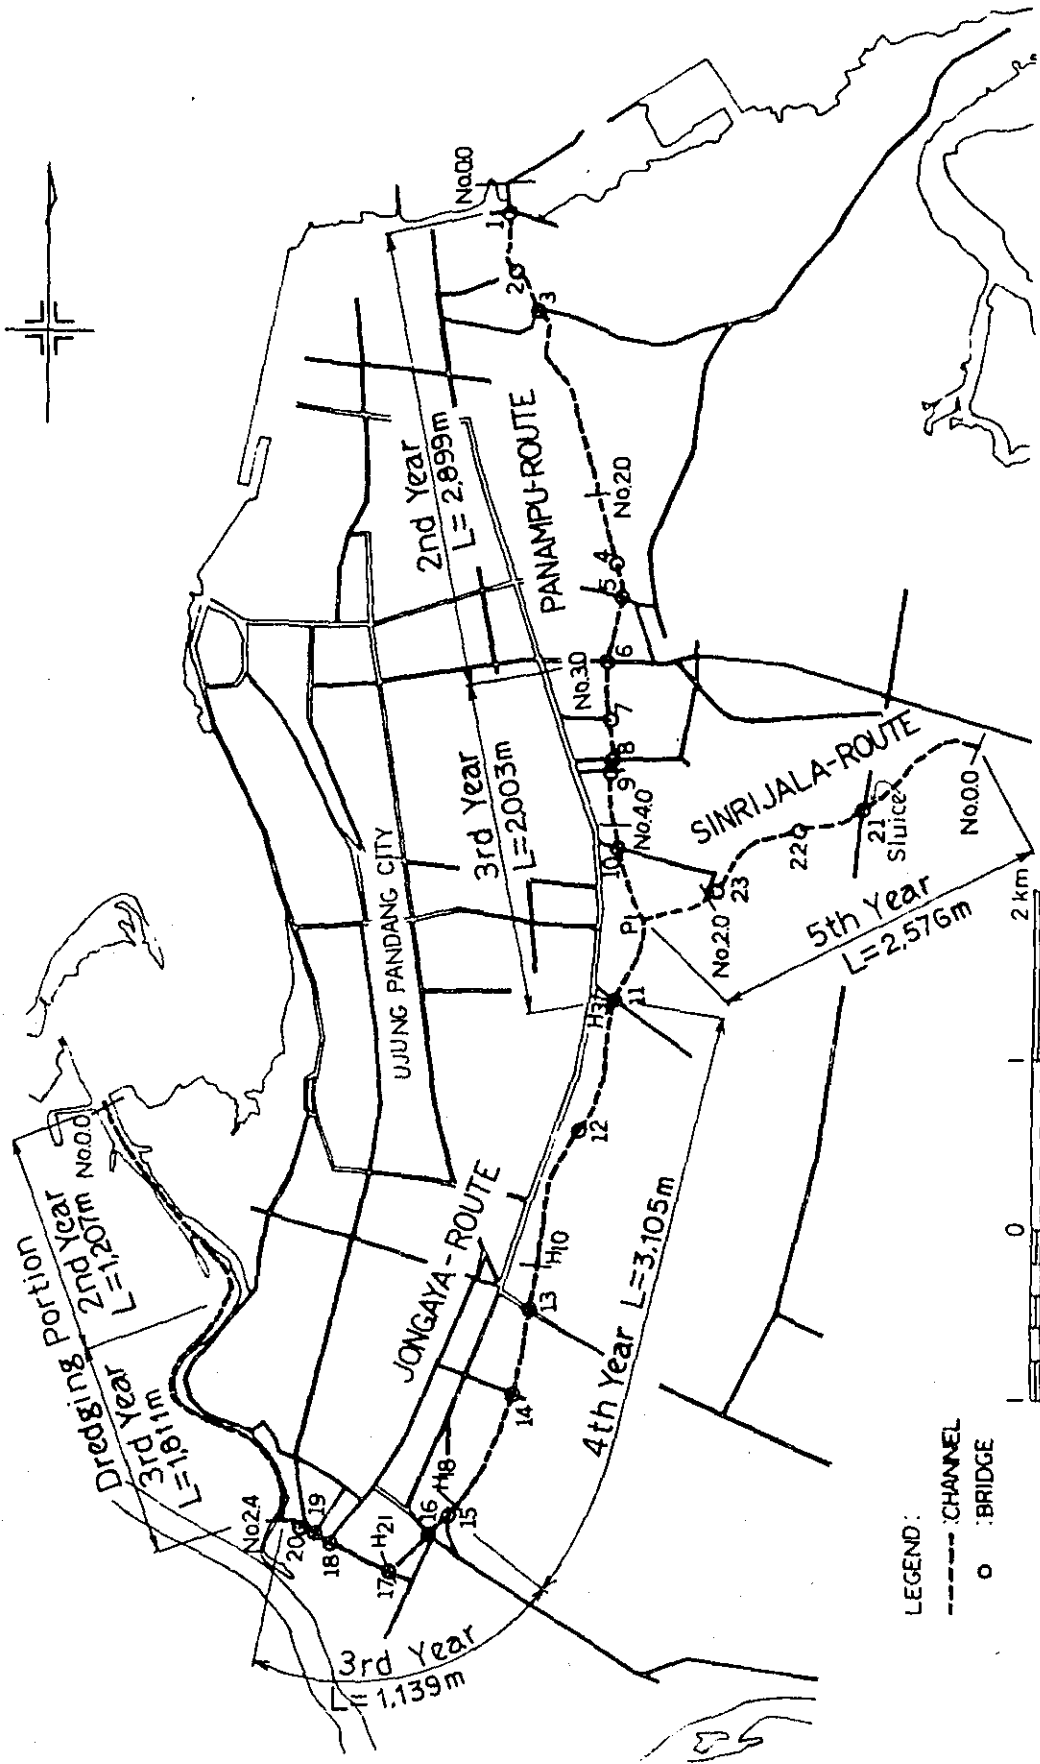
CONSTRUCTION SCHEDULE (DRAINAGE IMPROVEMENT)
